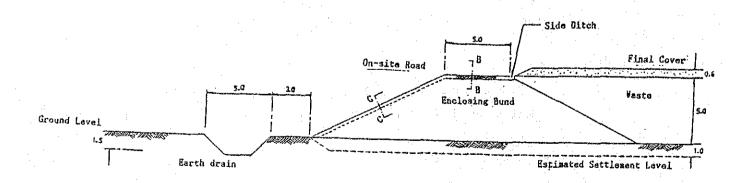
Typical Cross Section of Surrounding Drain
